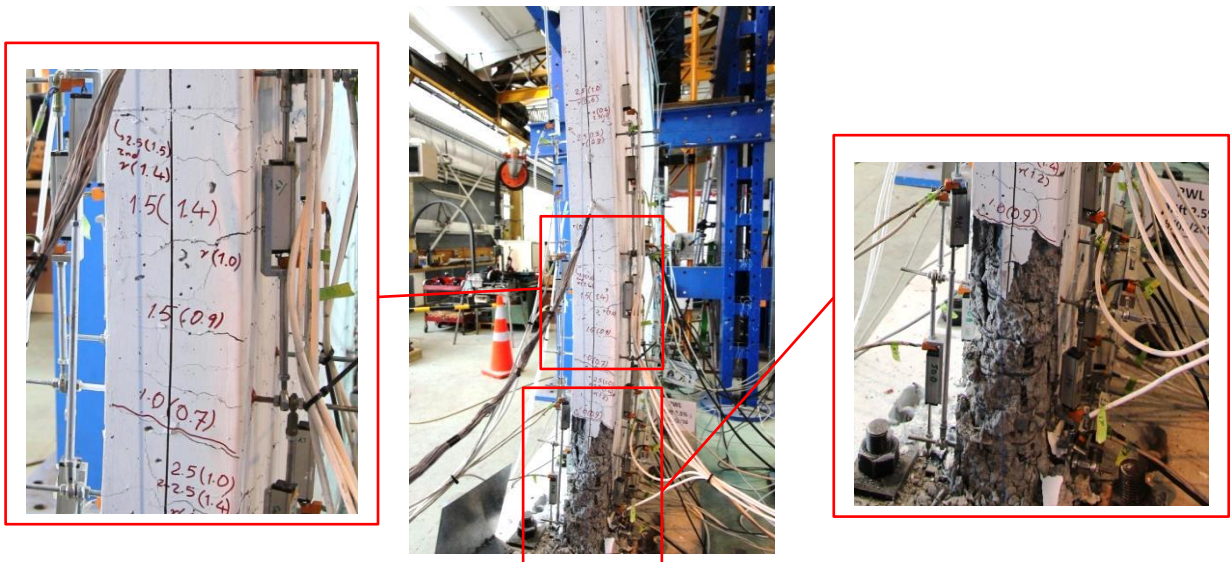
Crack pattern and cover spalling at maximum out-of-plane deformation, east boundary at 2.5% drift cycle
